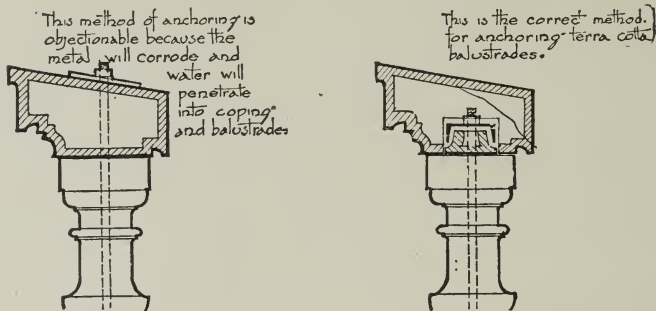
Terra-cotta Rail and Baluster. Bad and Good Construction.
